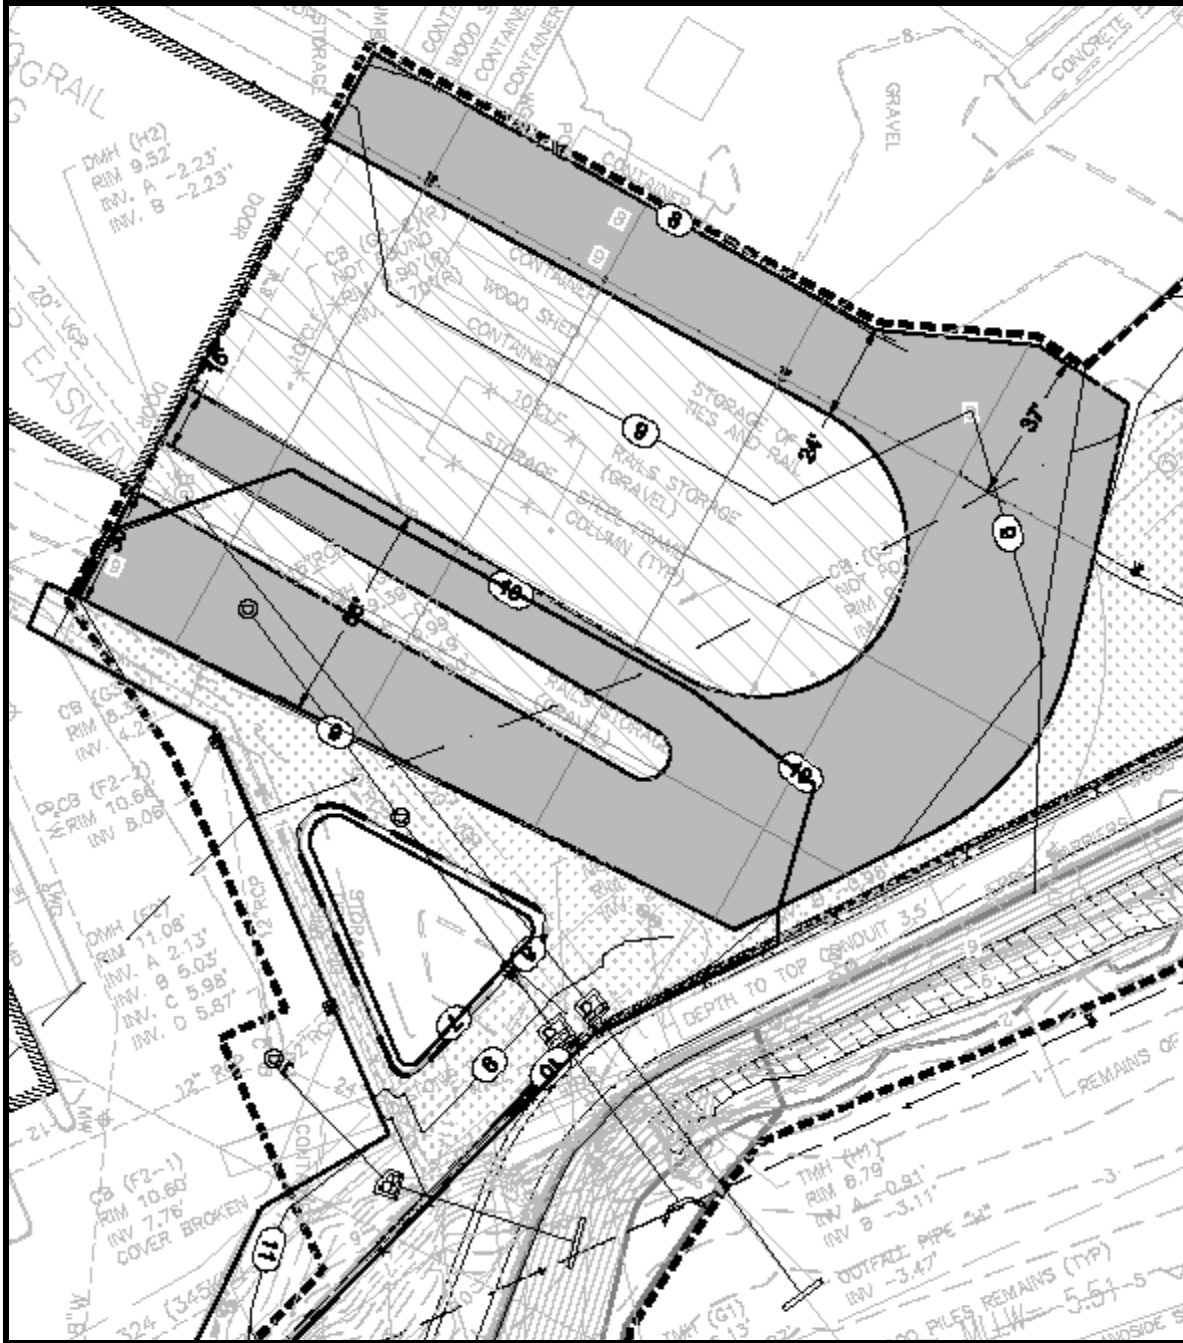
Paving and Grading Plan, Engineering Rail Yard
